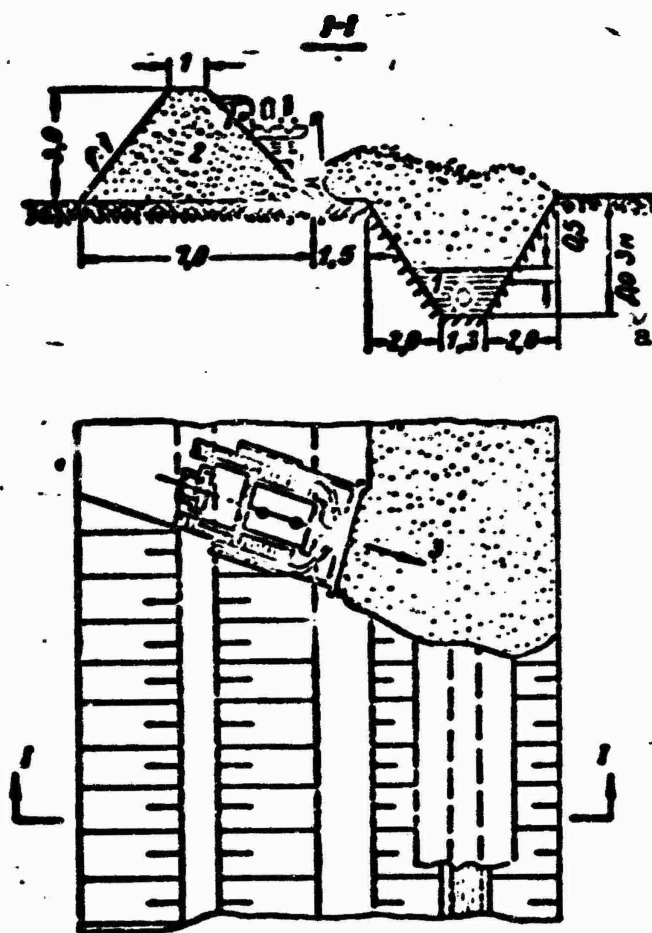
Filling of trenches. 1) Point at which the soil is filled in layers by hand; 2) point at which the soil is piled when the trench is dug; 3) direction of motion of bulldozer in filling a trench. a) Up to 3 meters.
